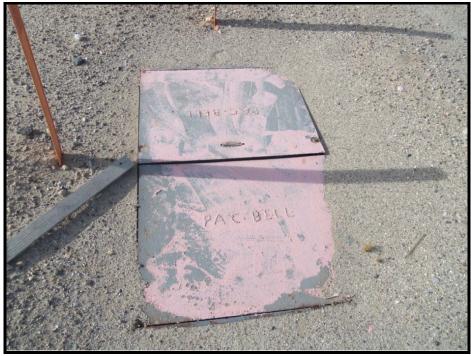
Subject site looking north along the east side of Brown Road at the Pac Bell (AT&T) telephone underground.
